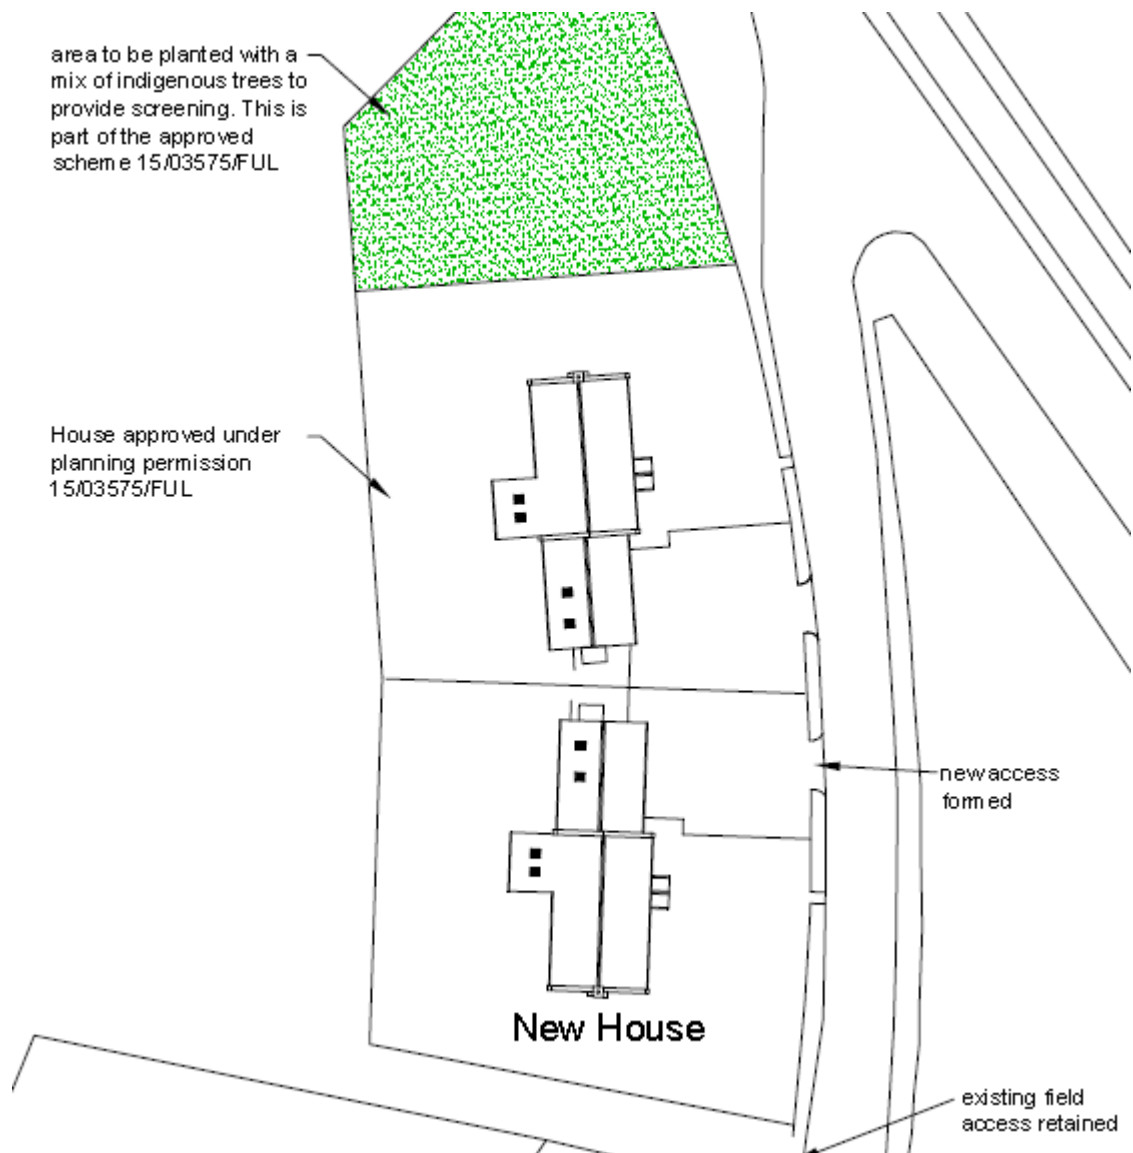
Proposed Site Plan. Note the infilling nature of the site.
